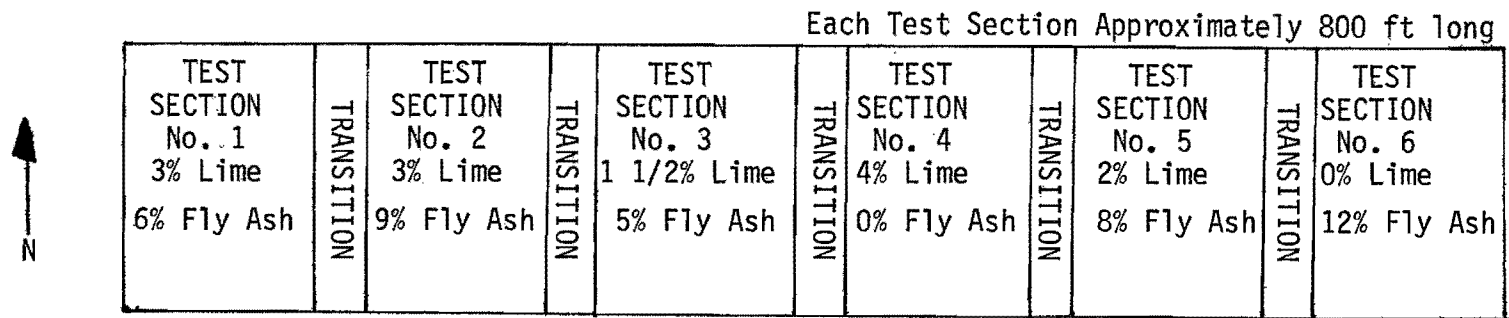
Layout Plan View of Test Sections on FM 1604 in Bexar County, Texas (Test Site No. 3)
